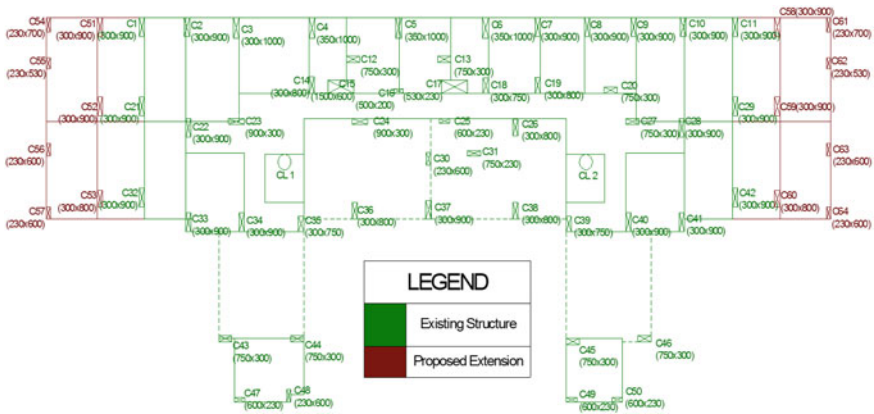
Layout of proposed extension of existing structure of G+10 building at Chhattisgarh
